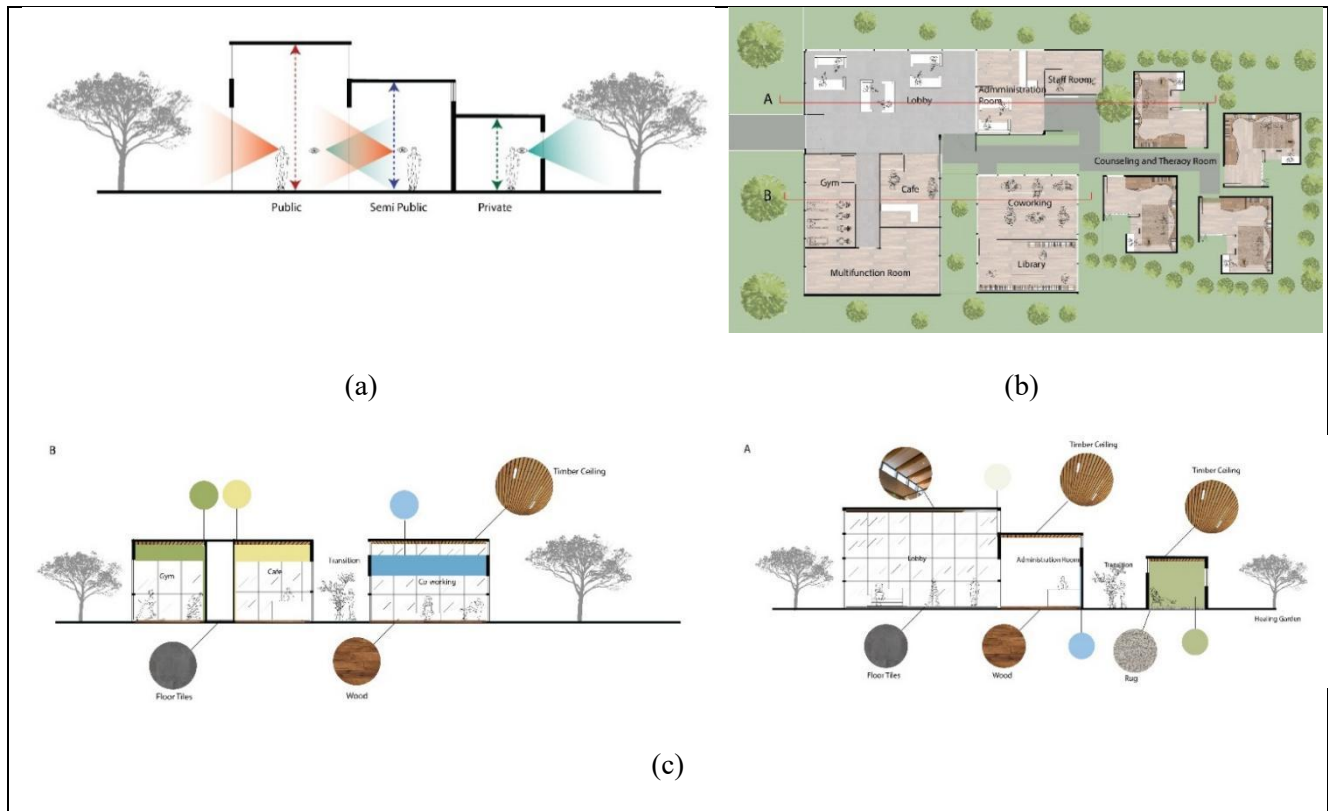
(a) Public private scale of space (b) Zoning plan (c) Materials and colors used
